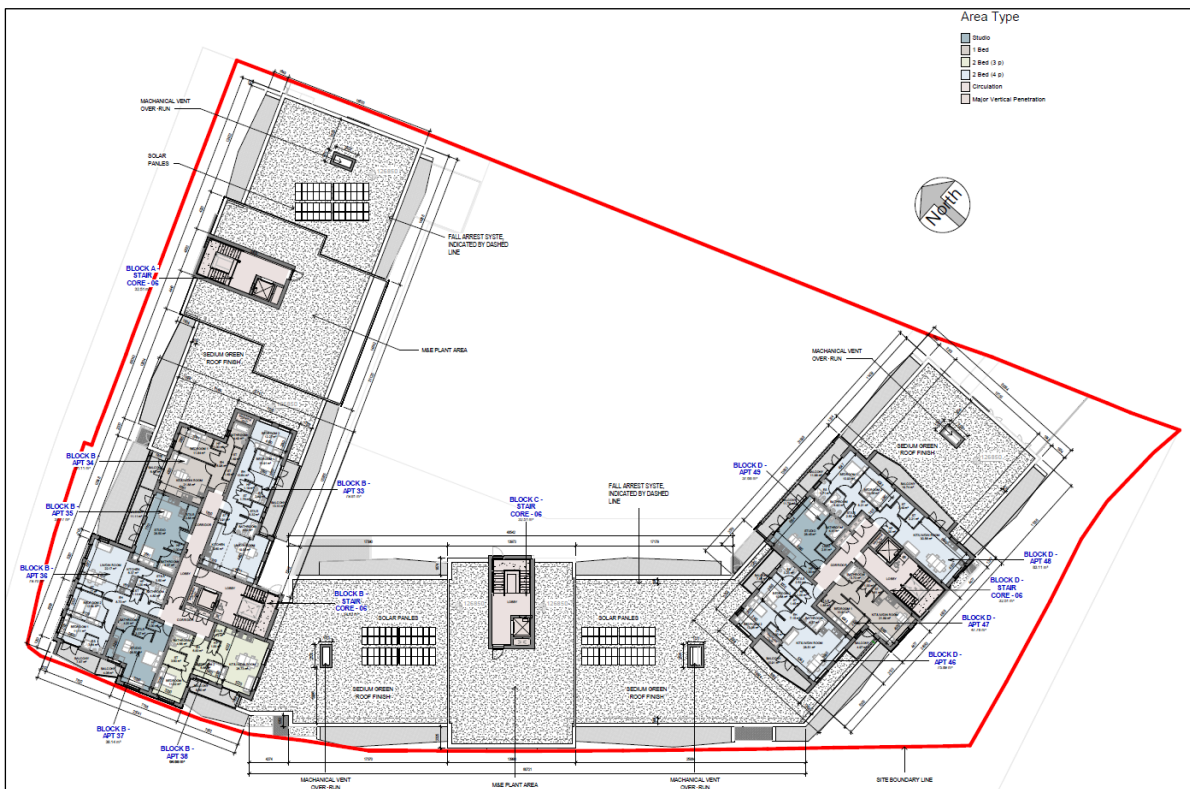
Sixth floor plan of development approved under ABP Ref. No. 303803-19
